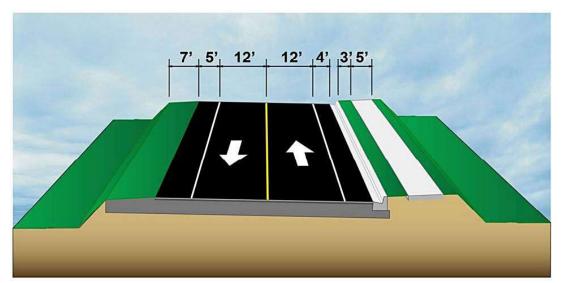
Two-lane typical section for Fort Hamer Road.
